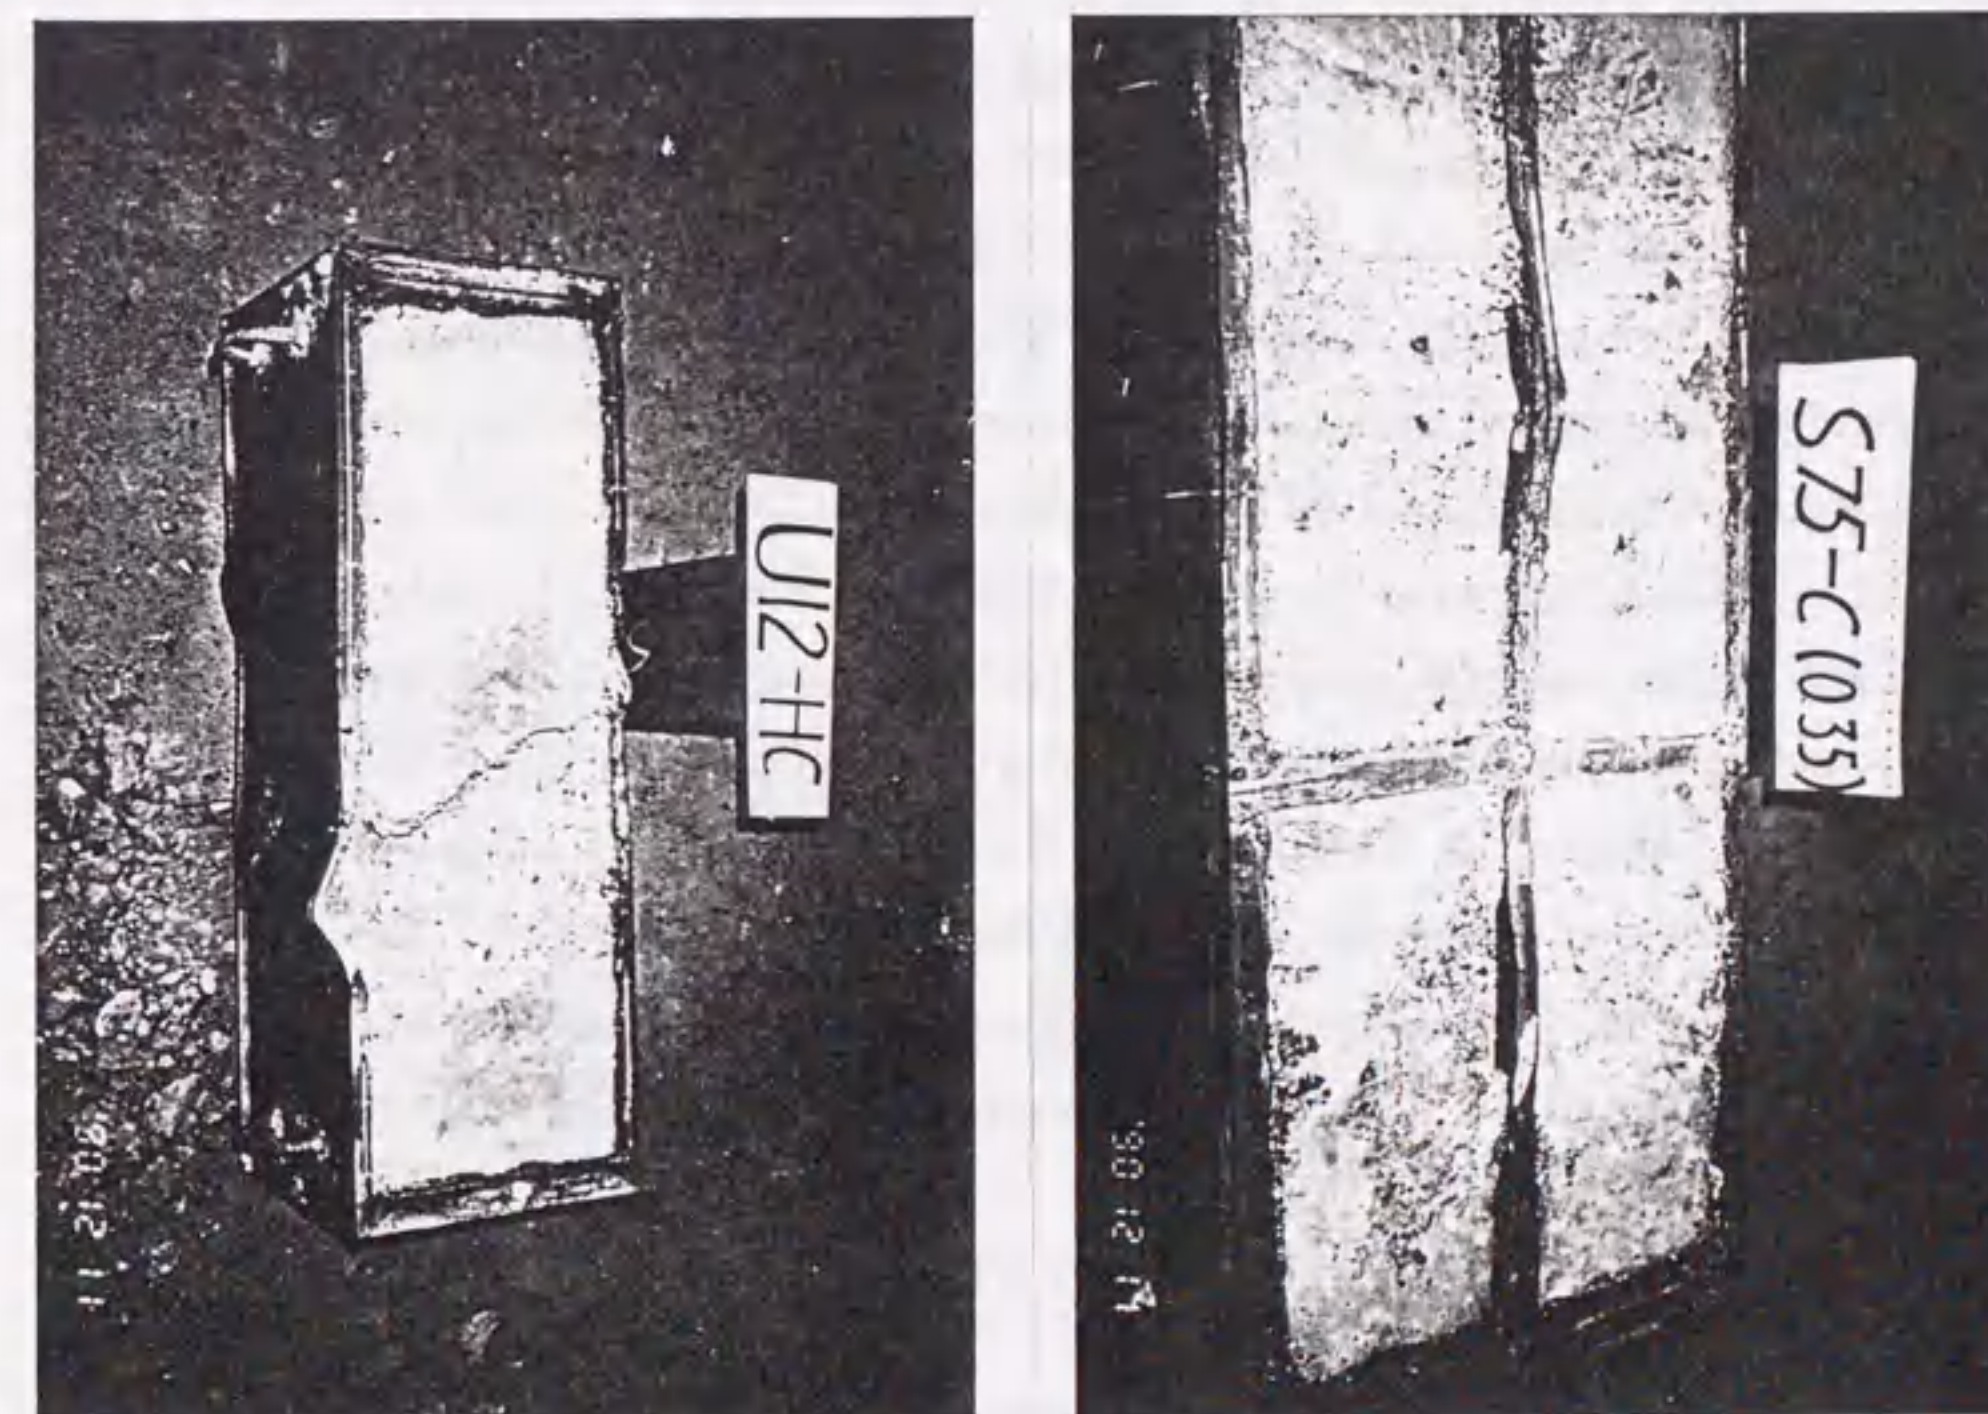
Typical Failure Appearances of Filled-in Concrete
